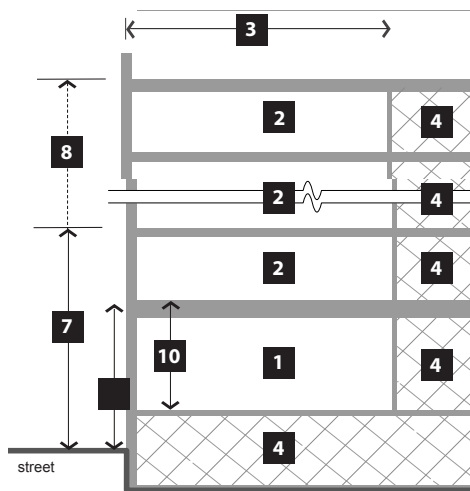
Civic building height and use diagram shown with basement and rear building interior parking and parapet roof type. Not to scale.
